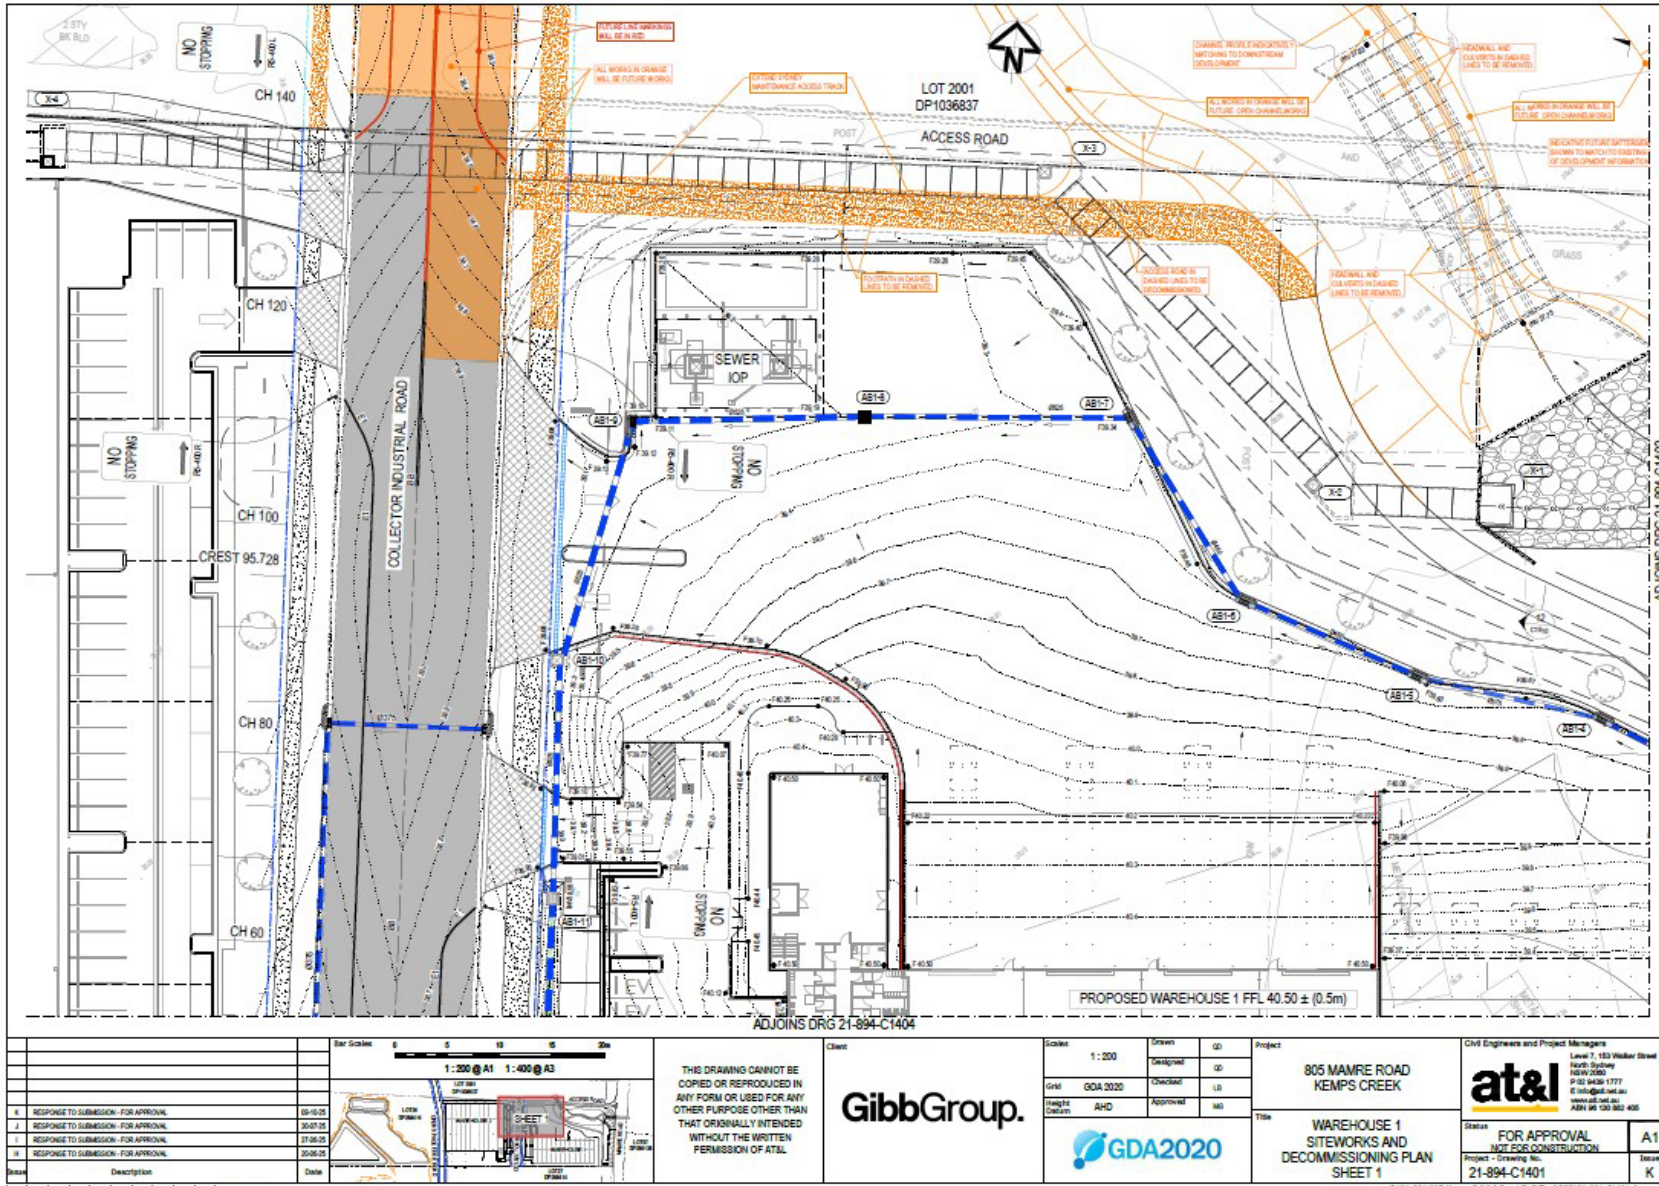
Interim Site Access — Decommissioning Plan (Sheet 1)
